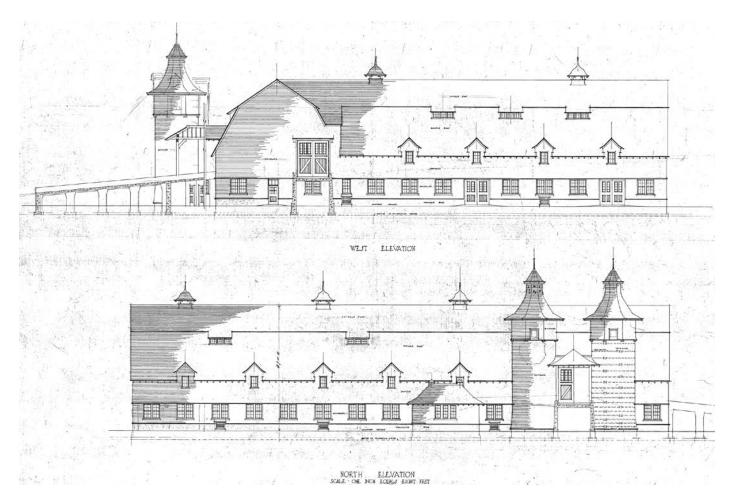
Elevations by Brown and Vallance Architects. In these drawings the lower walls of the barn are indicated to be wood rather than stone. The barn was not built exactly as shown. Retrieved from Facilities Management Division Asset Record system, File B-1-T.
